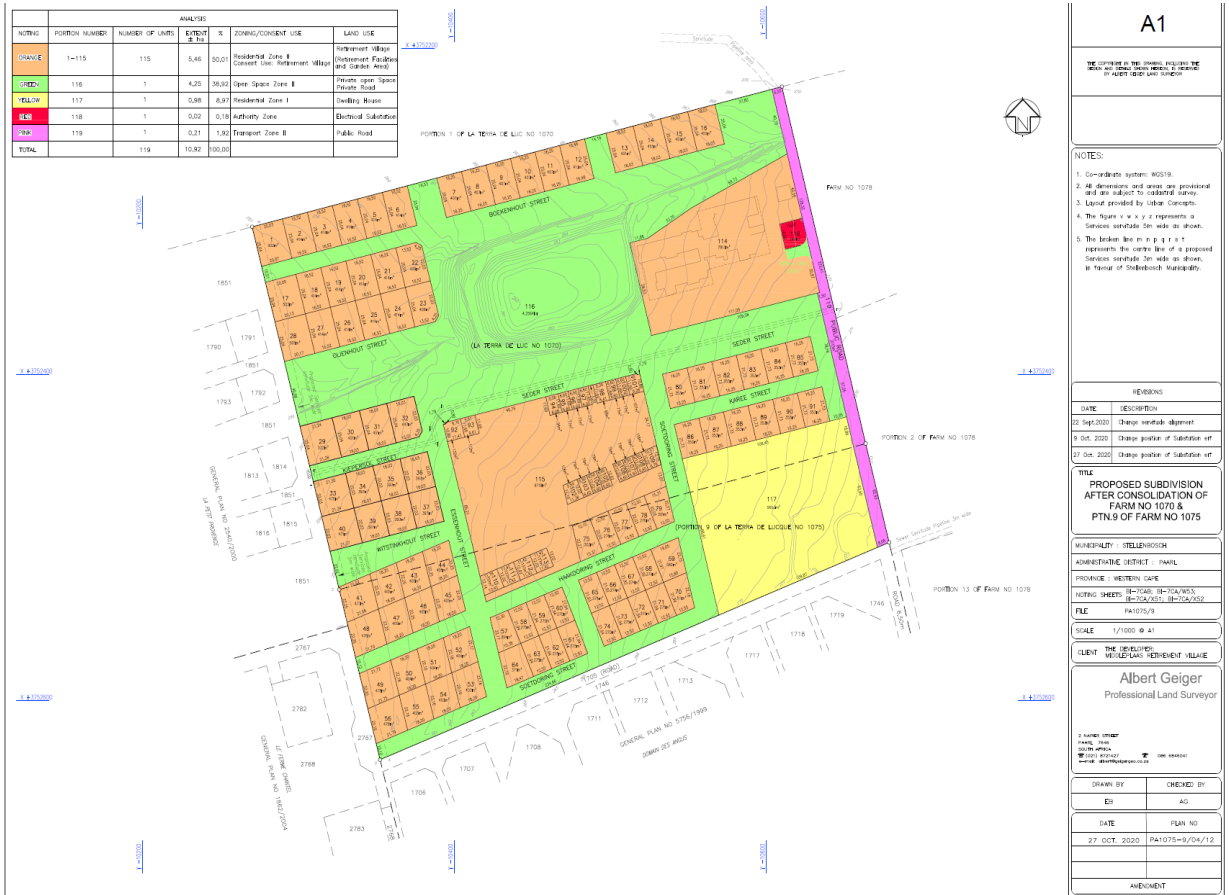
Site Development Plan indicating the area where the retirement village is proposed on a portion of Portion 9 of the Farm La Terra De Lucque No. 1075 and a portion of the Remainder of Farm La Terra De Luc No. 1070, Franschhoek. The yellow block referred to as Erf No. 117 is excluded from the development area.
